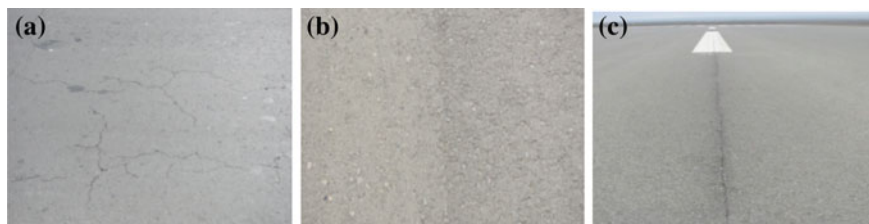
Photo of defects: a Cracking of pavement, b Mix segregation, c Low quality transversal joints
